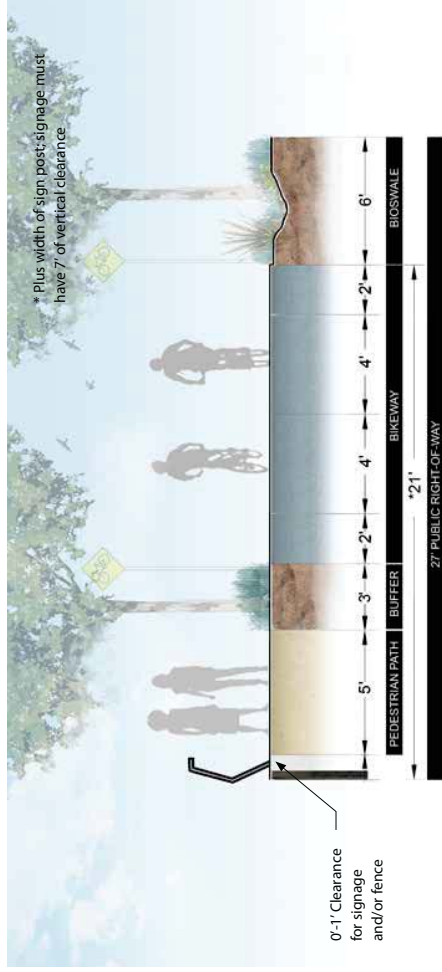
Radford Avenue to Collfax Avenue - Typical Cross Section
